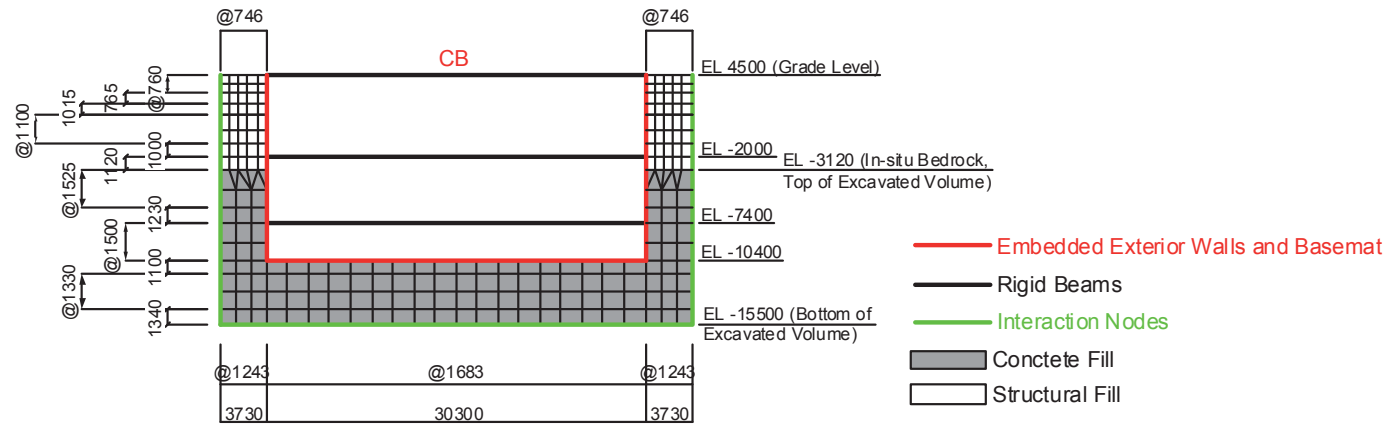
(e) Elevation C-C' Structure Model (FE)
